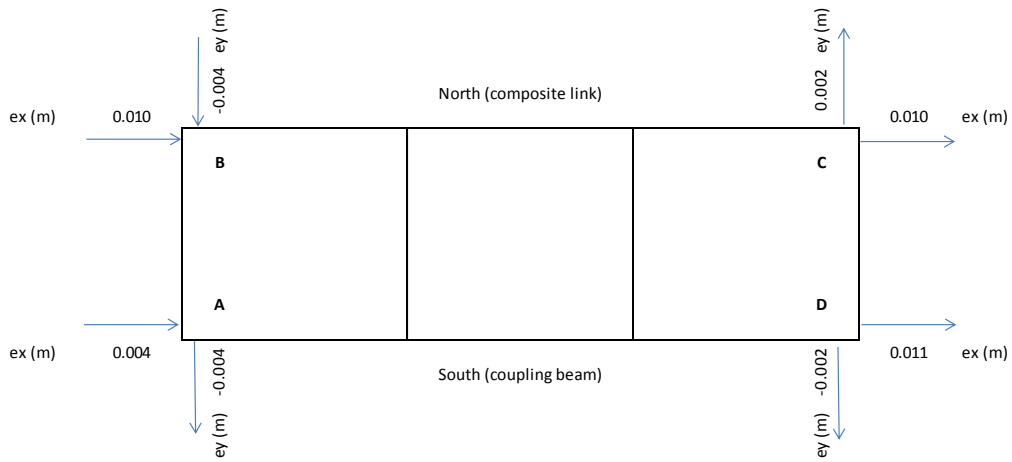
Out of plumb, 2nd measurement, 1st floor
